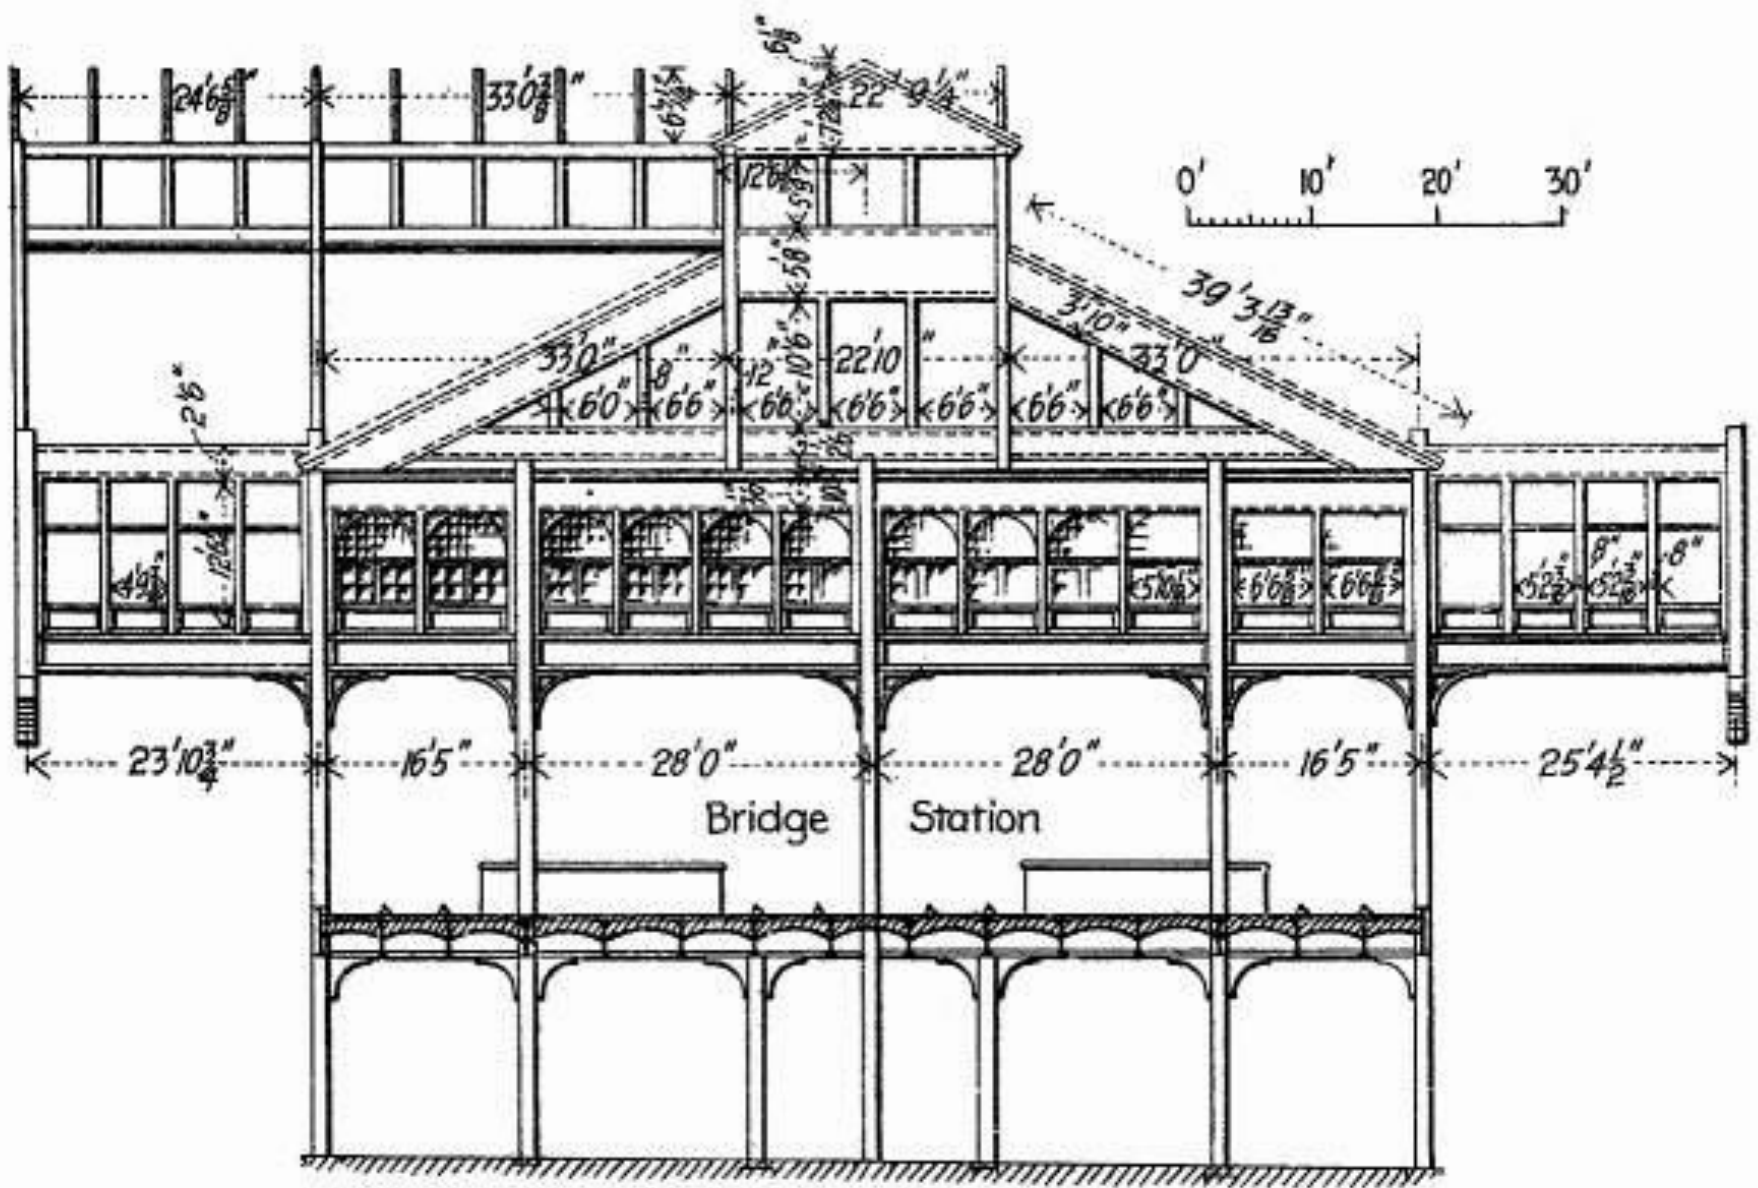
ELEVATION AND SECTION AT SANDS ST. END OF STATION.
